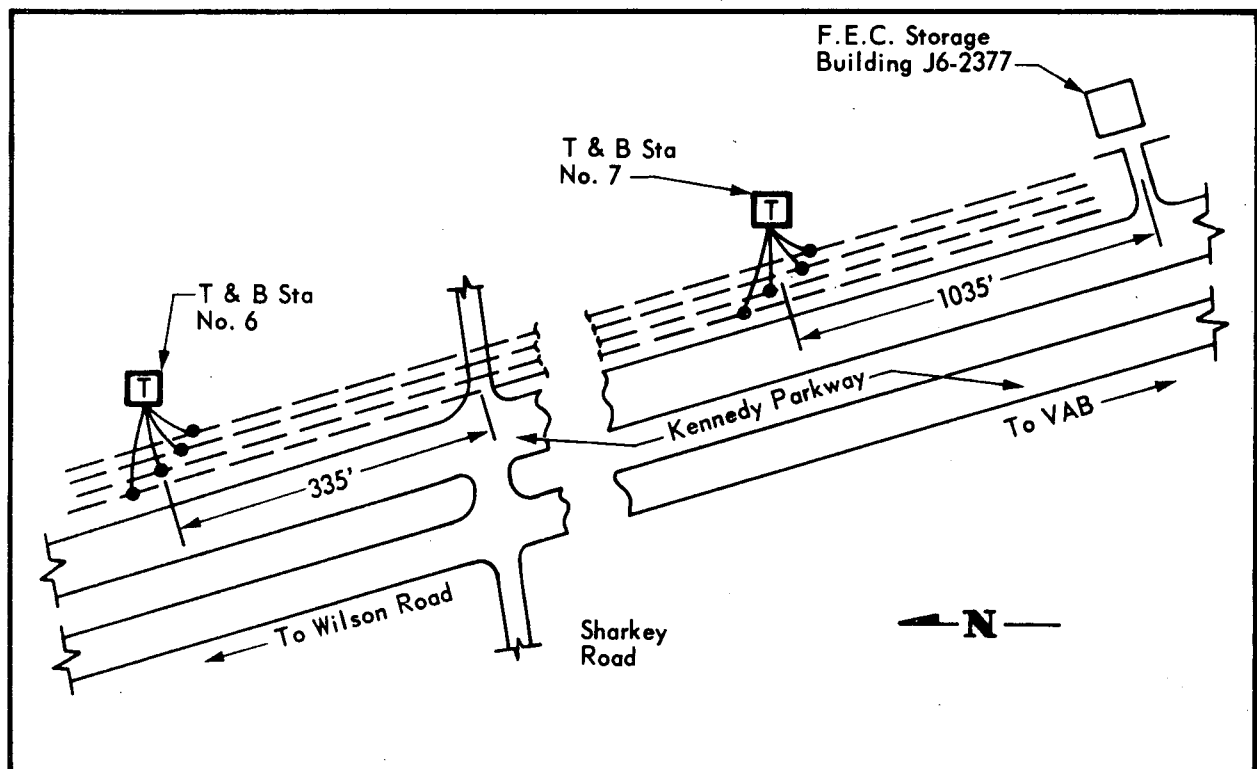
Test and Bond Stations No. 6 and 7 Equipment Locator
